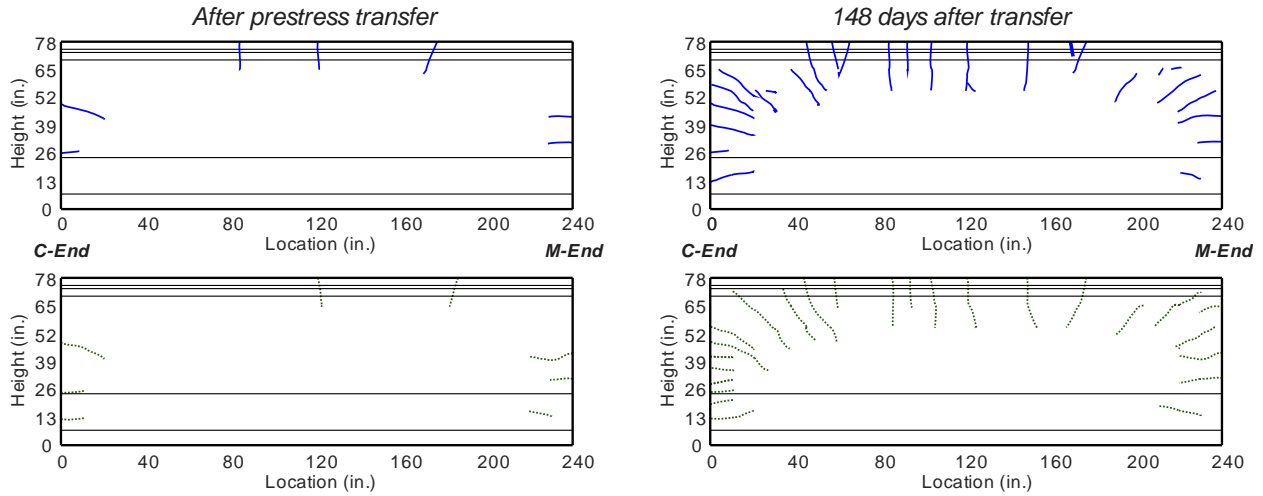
SH-30 Crack patterns shown on North face of specimen. Solid blue lines depict cracks visible on the North face and dashed green lines depict cracks visible on the South face.
